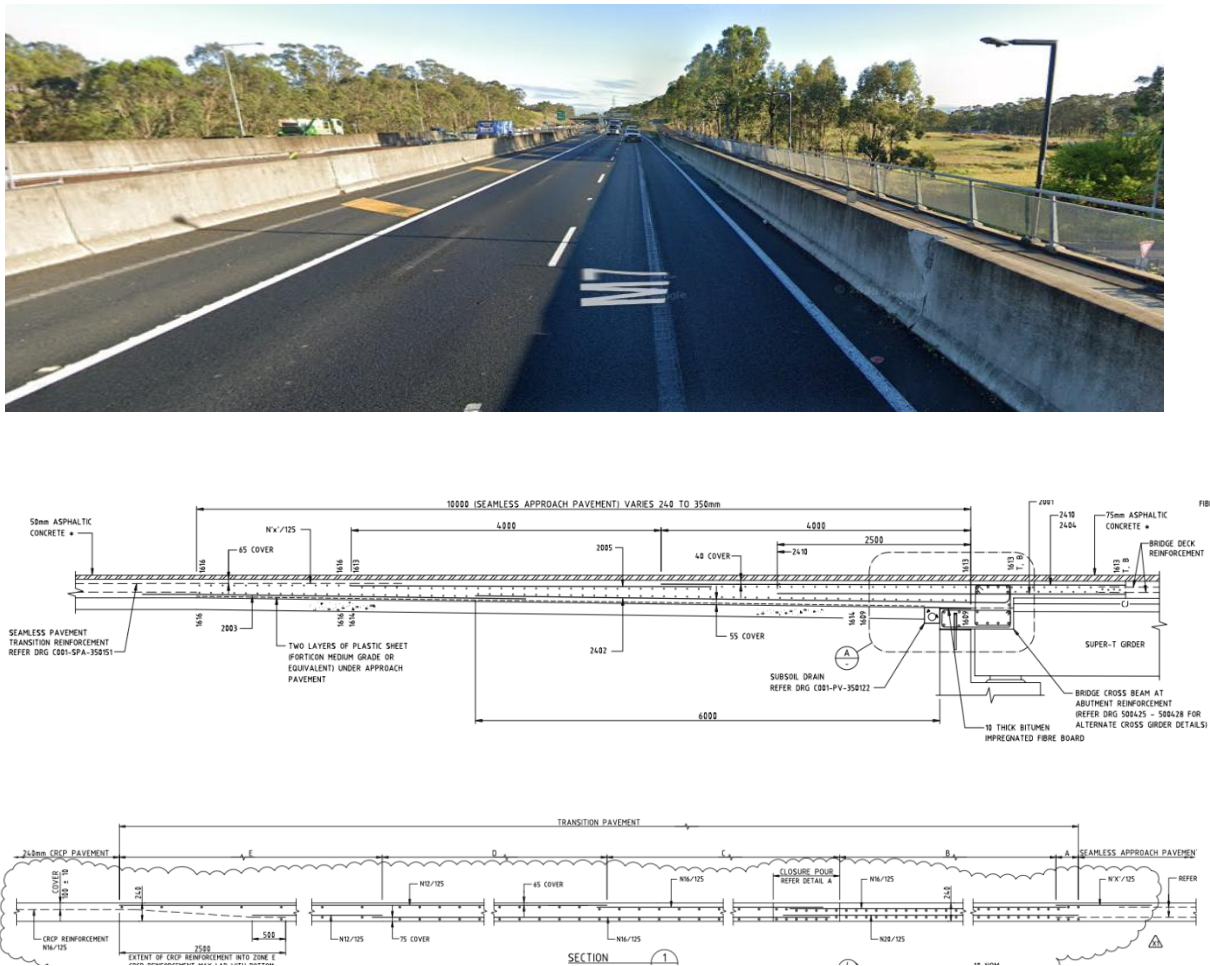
Typical Seamless Pavement Detail – Photo: Courtesy Google.
